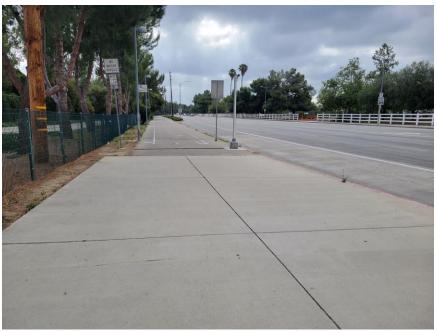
Overview of an underground section being repaired at West Oxnard Street and Etiwanda Avenue, view to west, April 28, 2022
